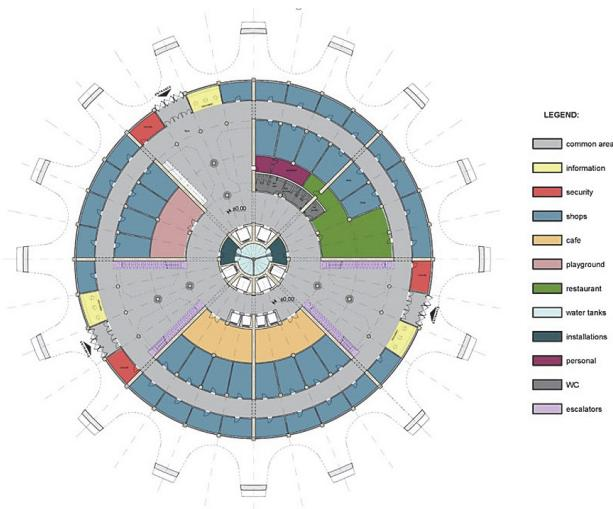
Architectural plan of the ground floor (level 0.00 m)
